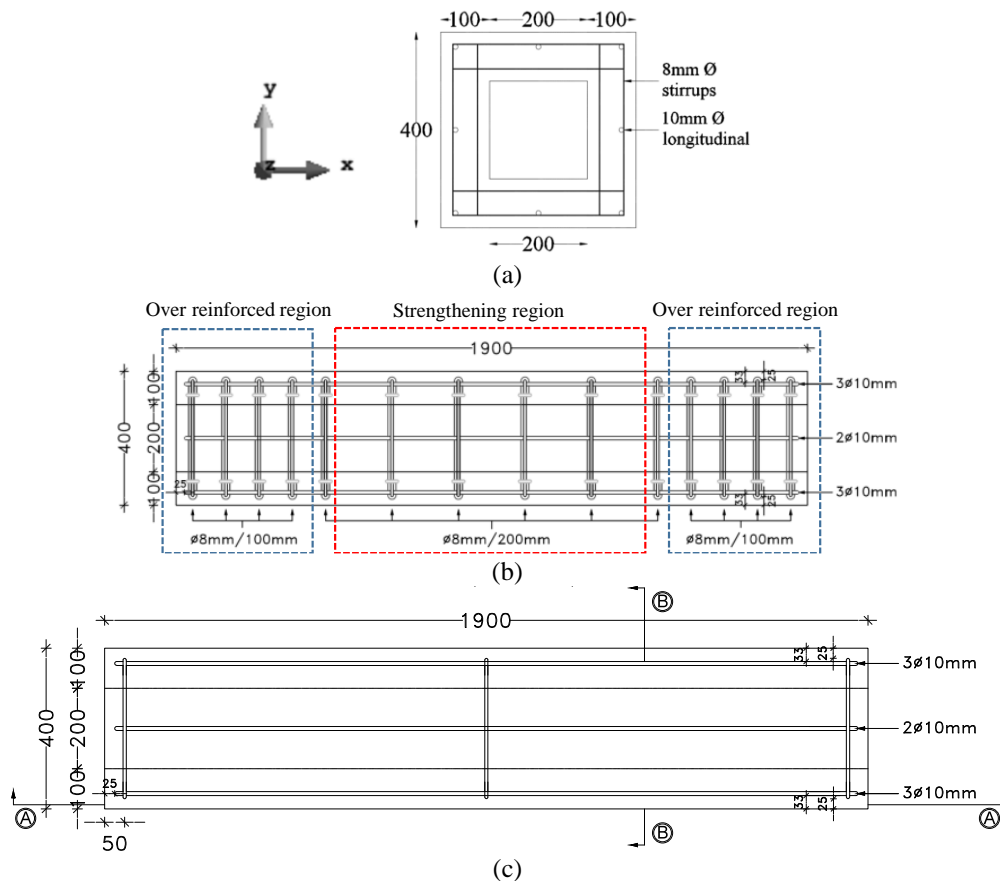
Geometric details (a) Cross section R_C35/45_4S (b) Longitudinal section R_C35/45_4S & (c) Longitudinal section R_C35/45_1S (dimensions in mm)
